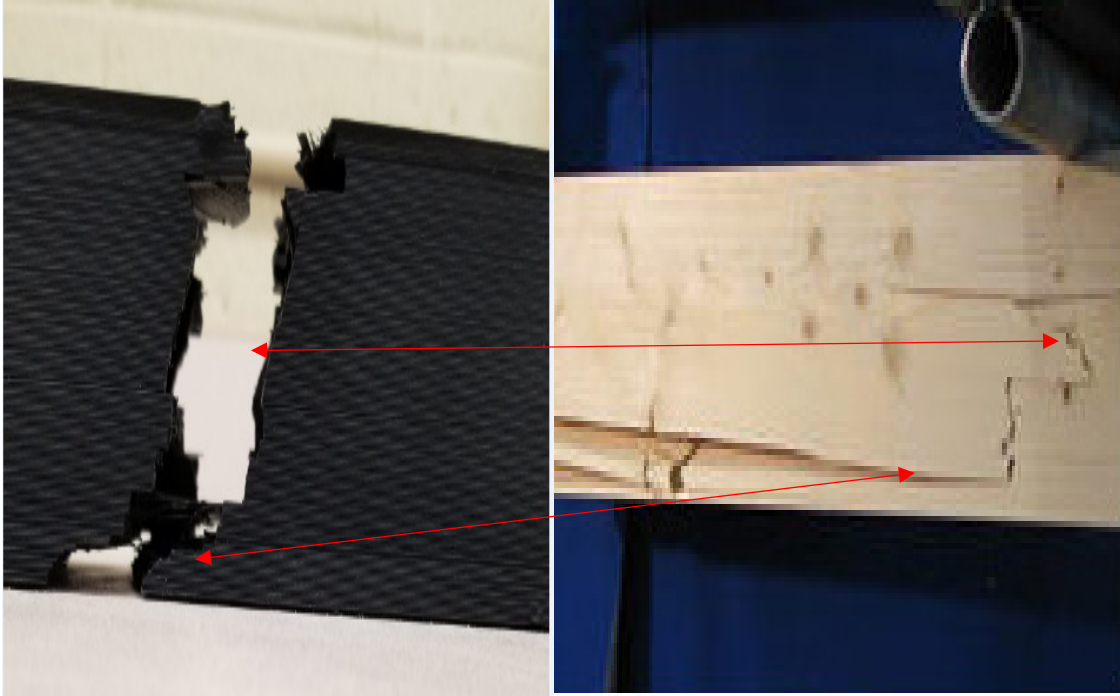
Beam after the brittle failure. Timber beam picture was adopted and modified from (www.hb.bgu.tum.de)
